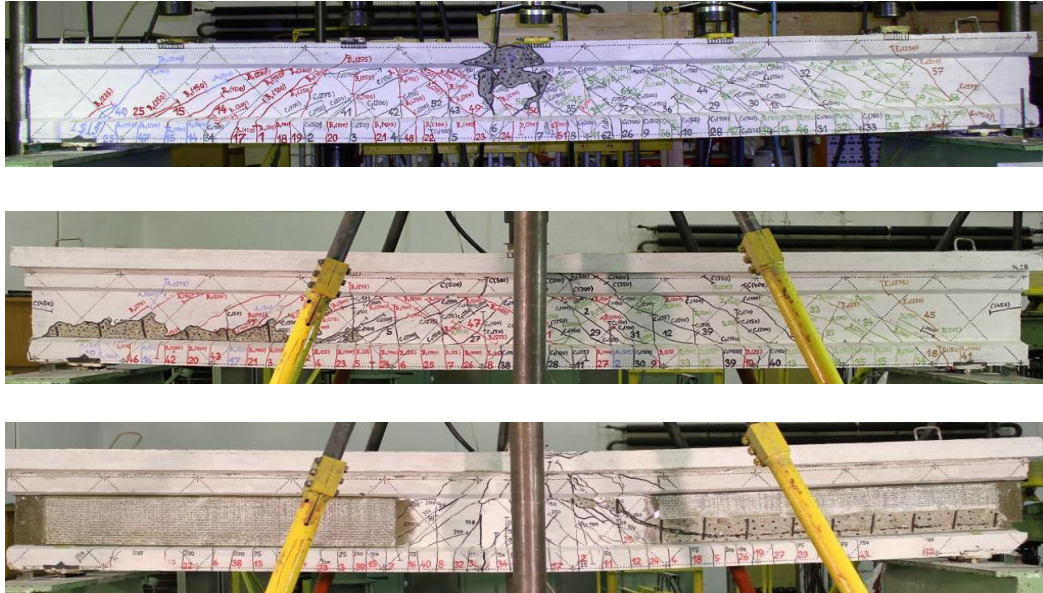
Way of failure – a) non-strengthened beam S/M – RB, b) strengthened beams S/M/PP – SS, c) S - SSF.
